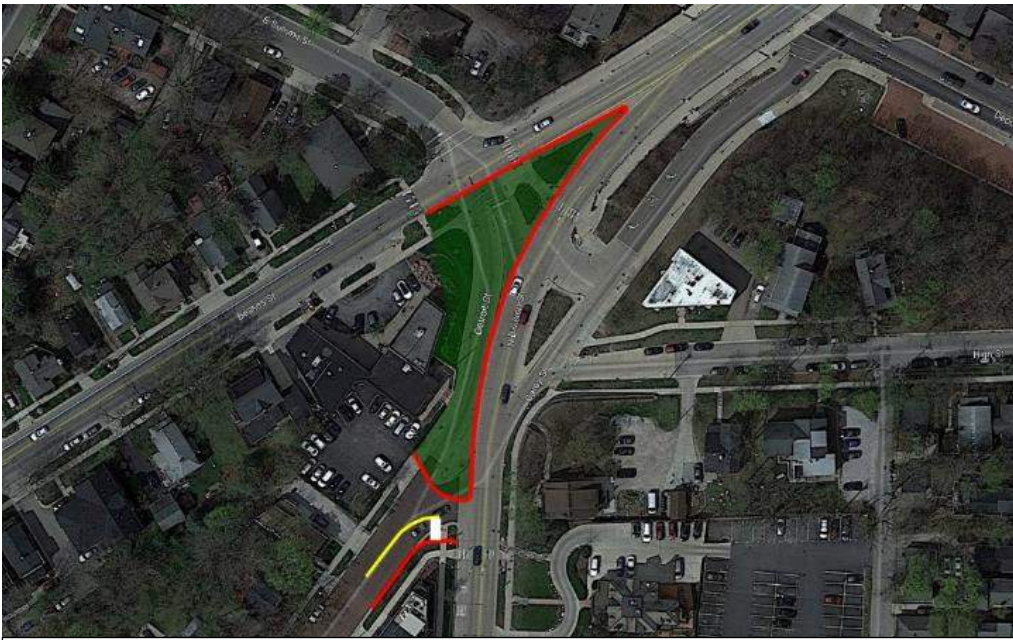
Option A – Close access between Detroit / Division and Broadway / Summit. This would eliminate conflicts with pedestrians crossing Beakes St and Broadway St. Crosswalk would be moved south along Division to improve visibility around the retaining wall.
